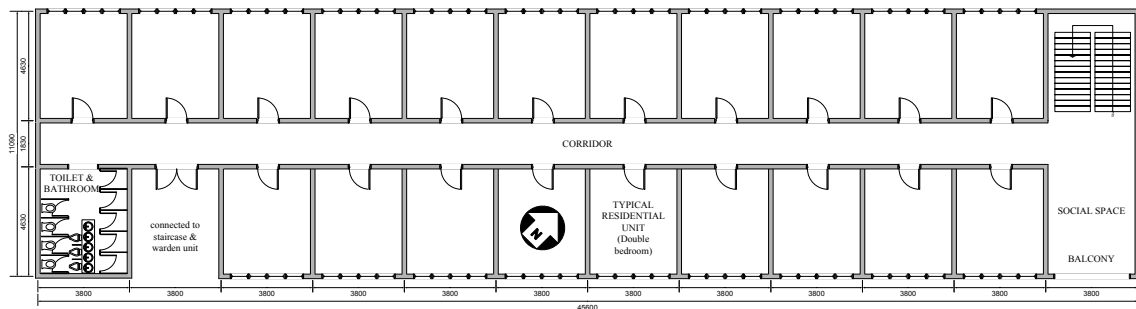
Floor plan of 3rd RC (new additional residential block - Block E)
